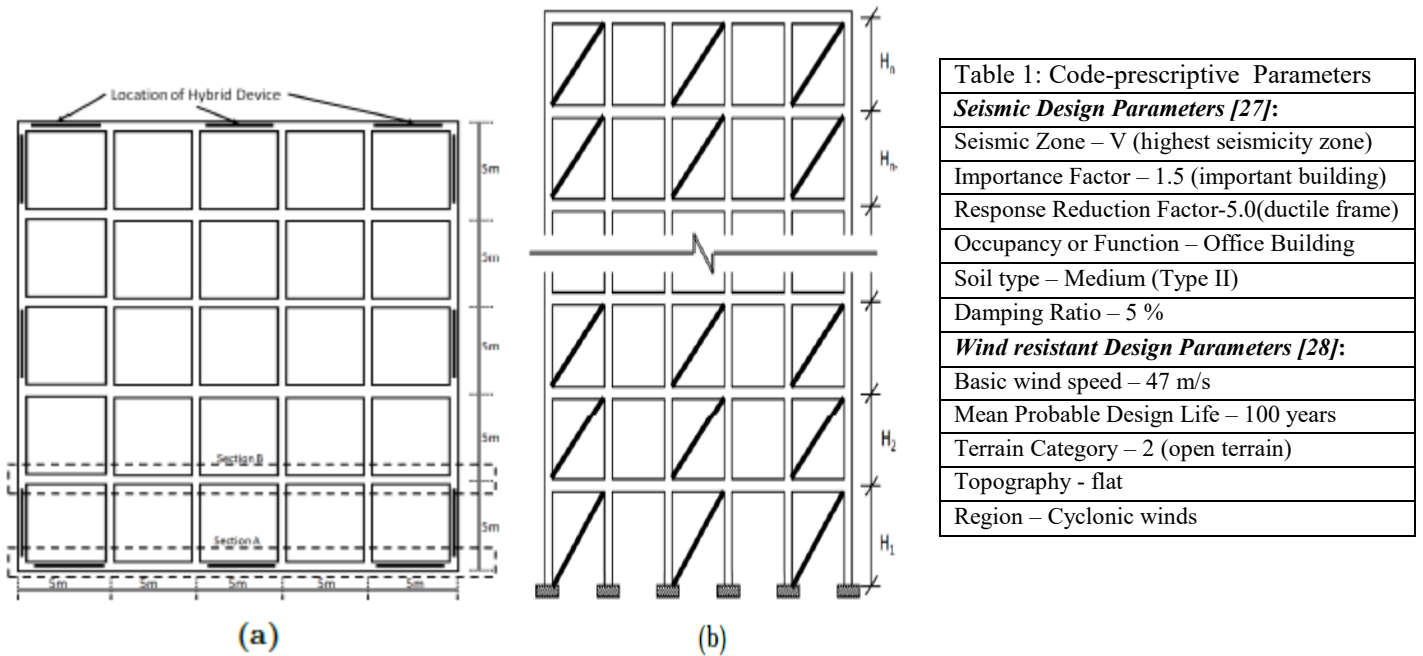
Typical framing (a) plan and (b) elevation of the multi-story RC building frame considered in the numerical case studies
